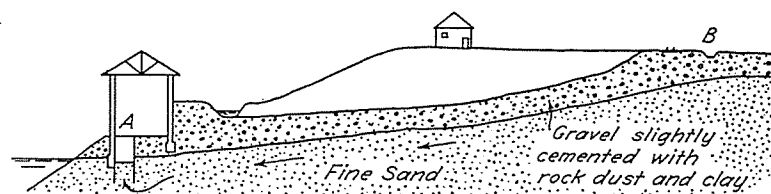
Diagram illustrating underground erosion produced by pumping mixture of sand and water from sump A. Sinkhole at B 300 ft distant from A.
